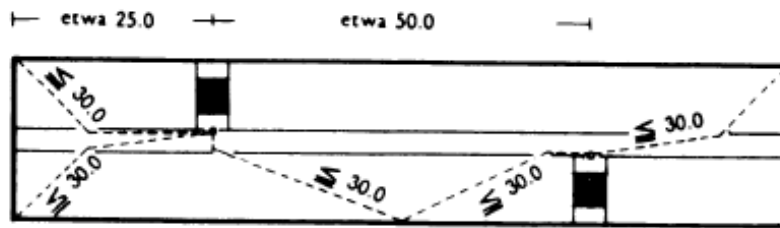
according to building codes, there must be eescape stairs no more than 30m from any point in a non-wotk room. It is best to calculate the distance of the staircases as 25m from the site boundary and distance between staircases as 50 m
